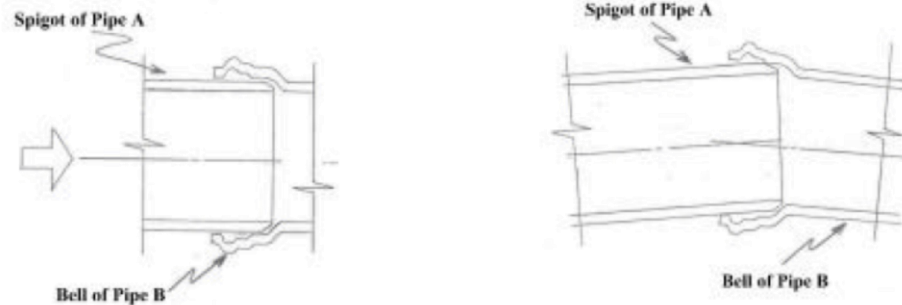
, b: Over Assembled Joint; Axially Offset Joint
